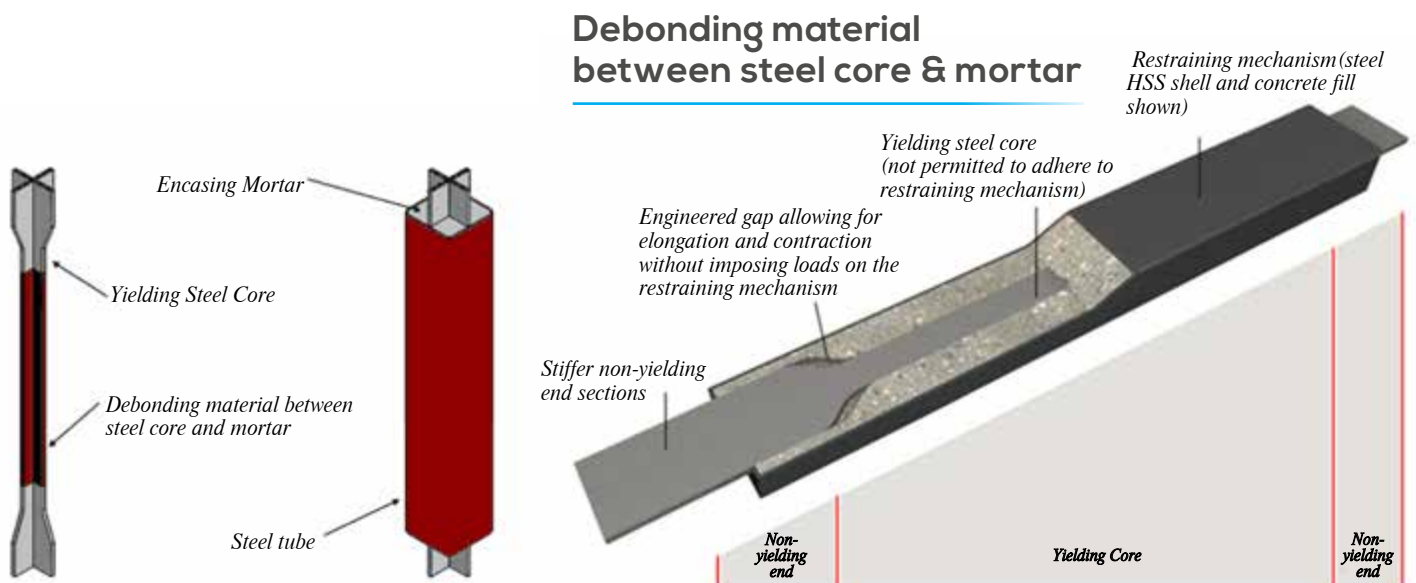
Schematic of a BRB – Source : American Institute of Steel Construction
